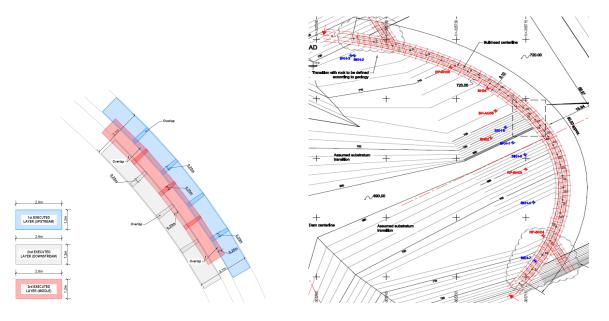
Bulkhead executed as overlapped diaphragm walls
